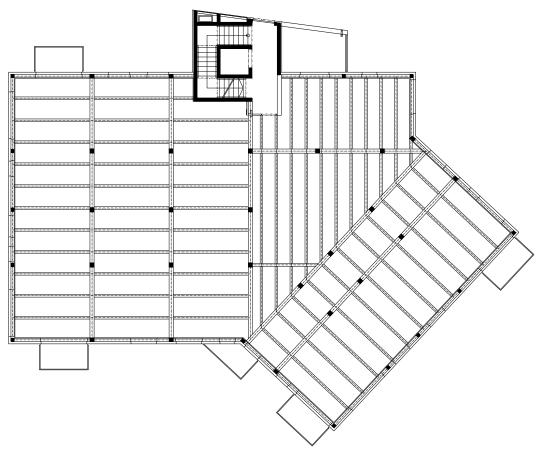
Layout of the structure of the 1^{st} , 2^{nd} and 3^{rd} floor
